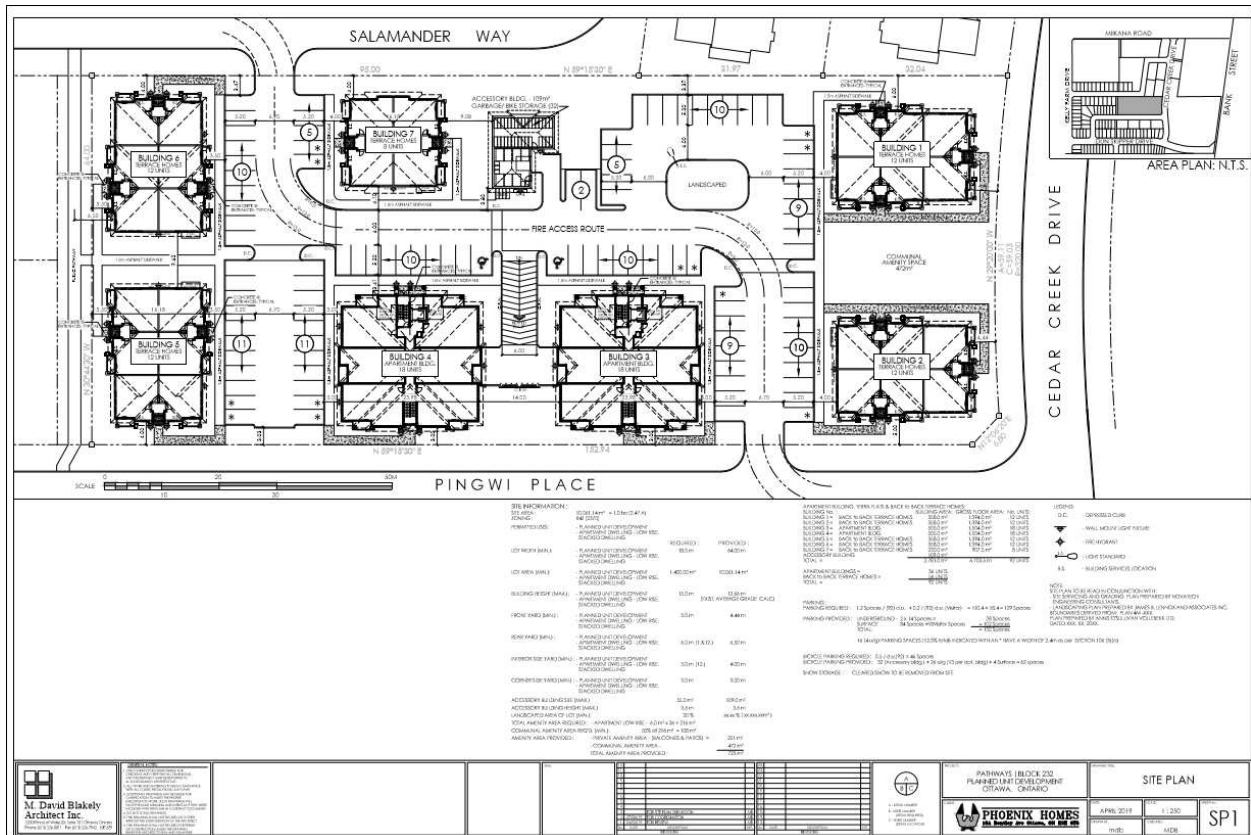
represents the site development concept plan for the proposed apartment and terrace home development. The plan features four-12unit, back-to-back 3.5-storey terrace unit buildings on the east and west sides of the
